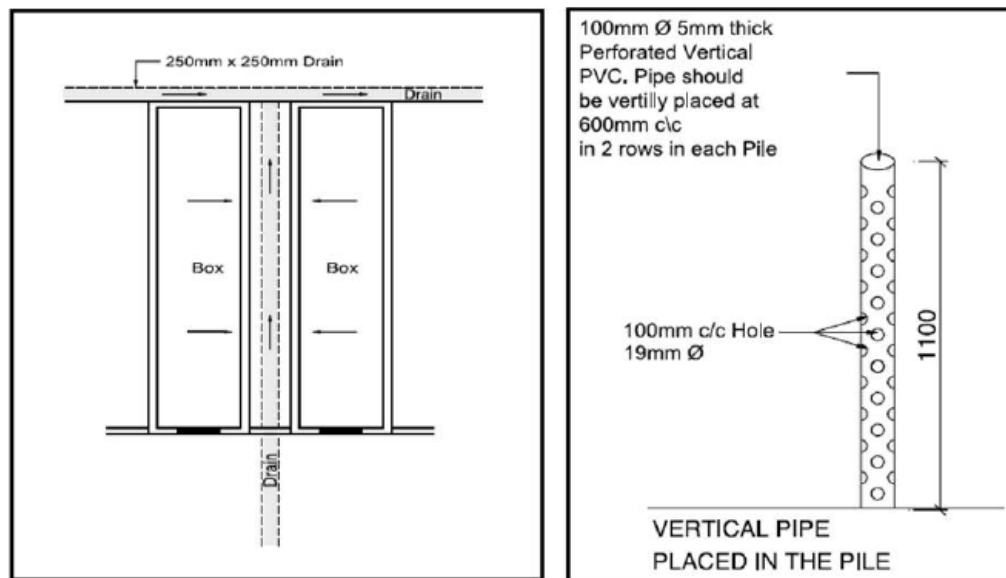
Cross section of drainage channels and vertical pipes²⁶
